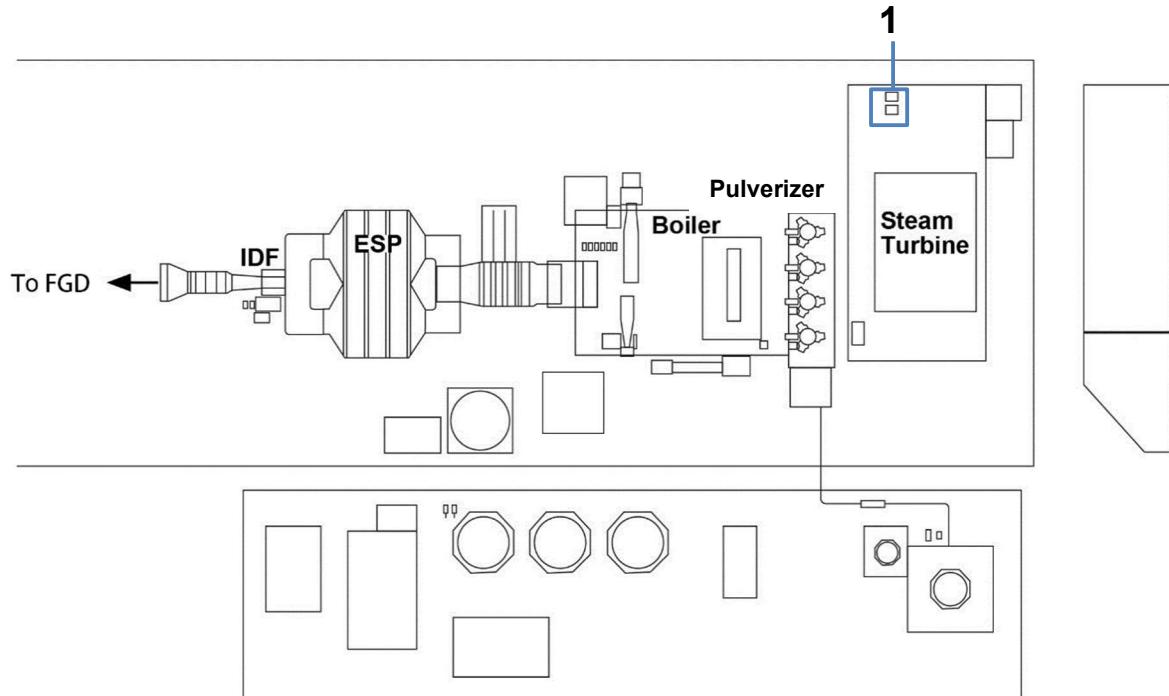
Compressed Air System Arrangement (Typical arrangement example)
